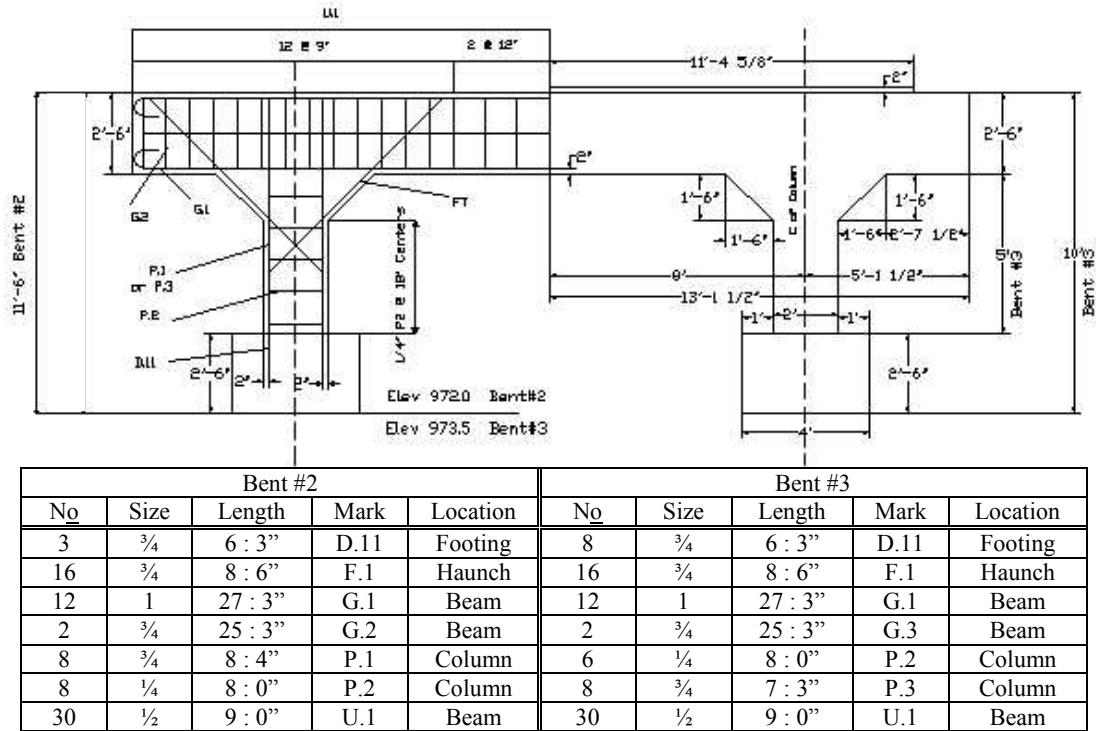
Original drawing of Bent 3 showing typical bent details.
